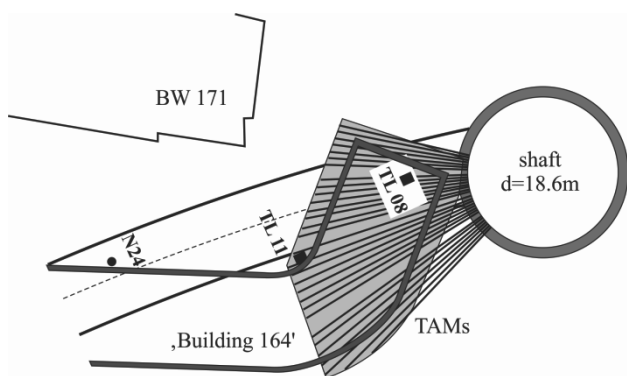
Plan view of the 'Building 164' next to the exit shaft.
